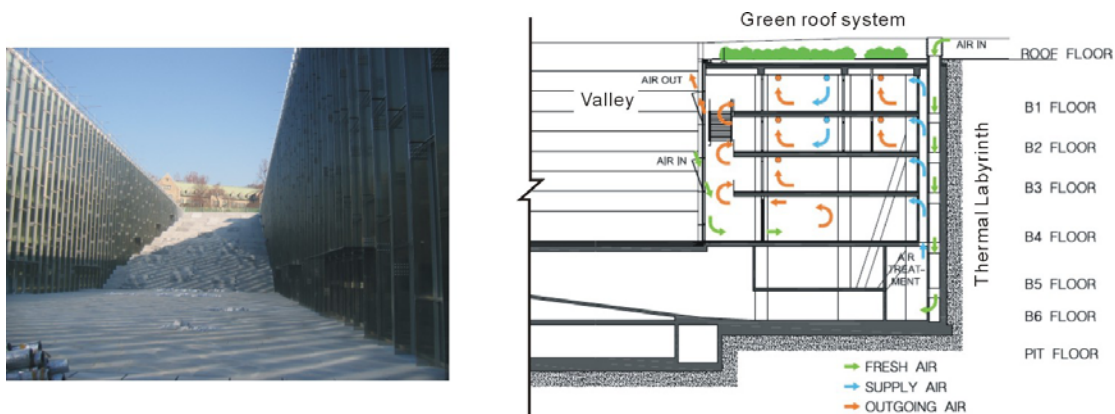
Outdoor air inlet windows for natural ventilation and green roof system of ECC
